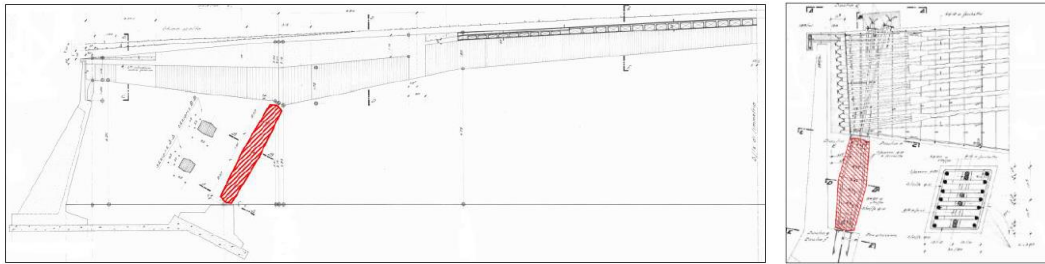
Critical elements of the Pavilion V: longer strut beams (left) and shorter strut beams (right)
